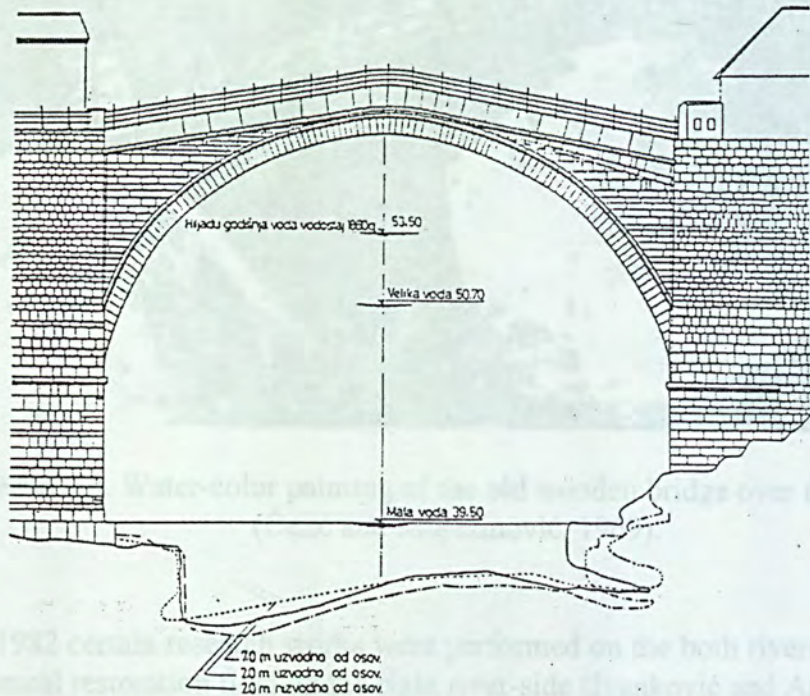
Outlook of the bridge with Neretva's river-bed and heights of water level
